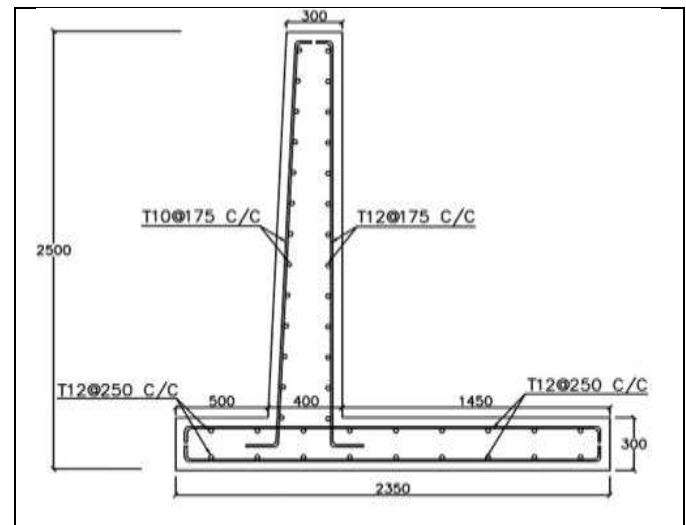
Dimensions and details of conventional precast RC cantilever retaining wall.
